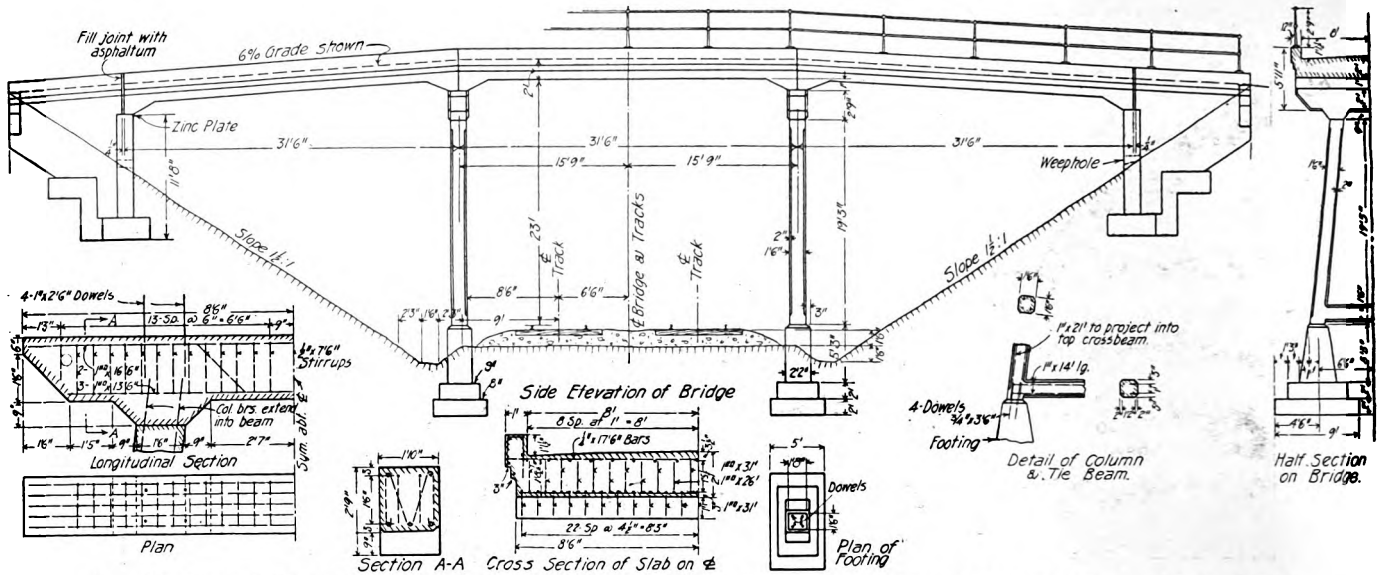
General Plan of Typical Reinforced Concrete Overhead Highway Bridge, 16 ft. Roadway, C., M & St. P. Ry.
